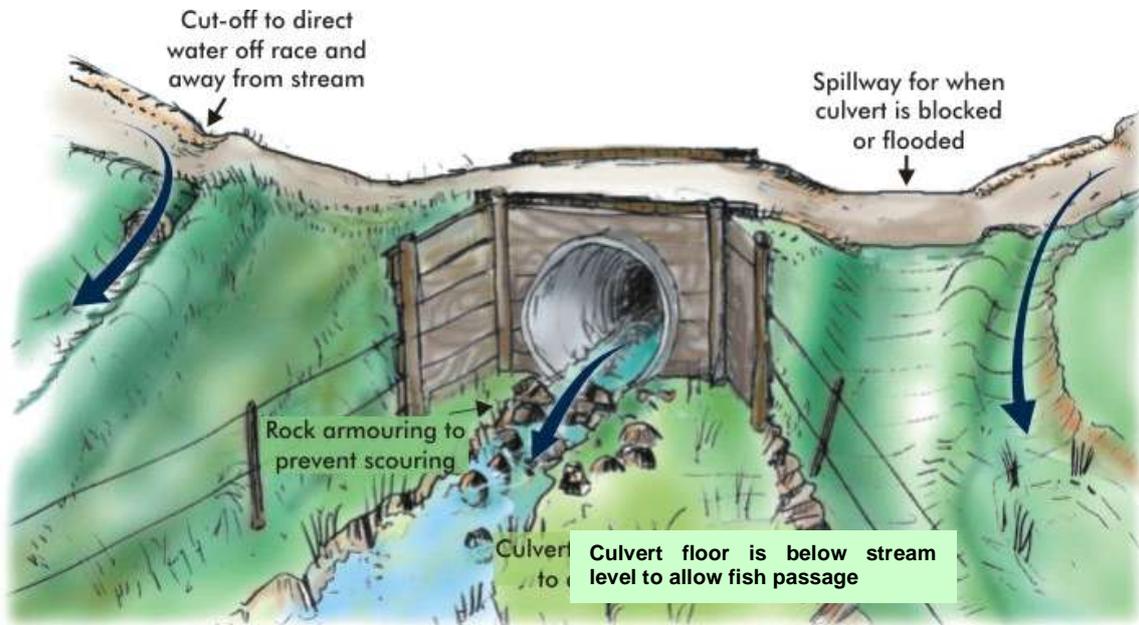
Outlet of typical Best Practice single barrel circular culvert
